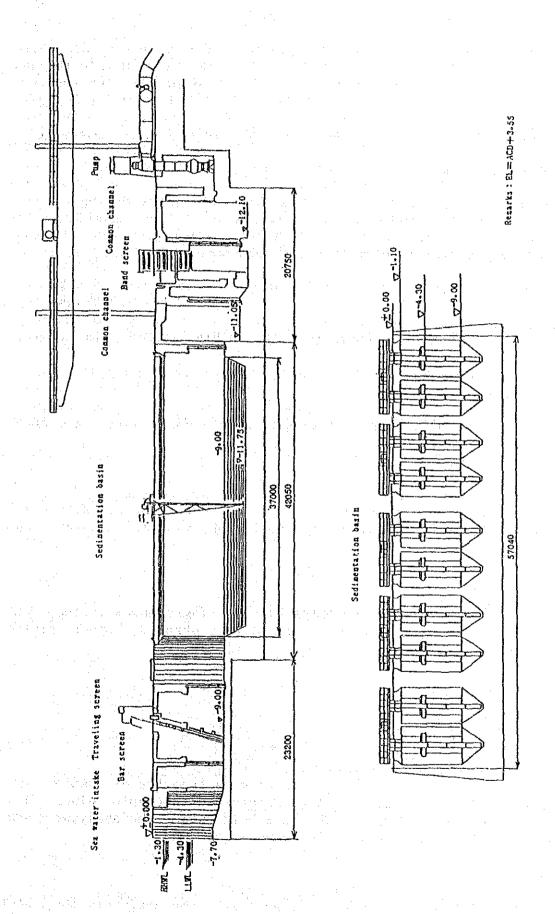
Vertical Profile Section of Sea Water Intake Facilities No. 1
